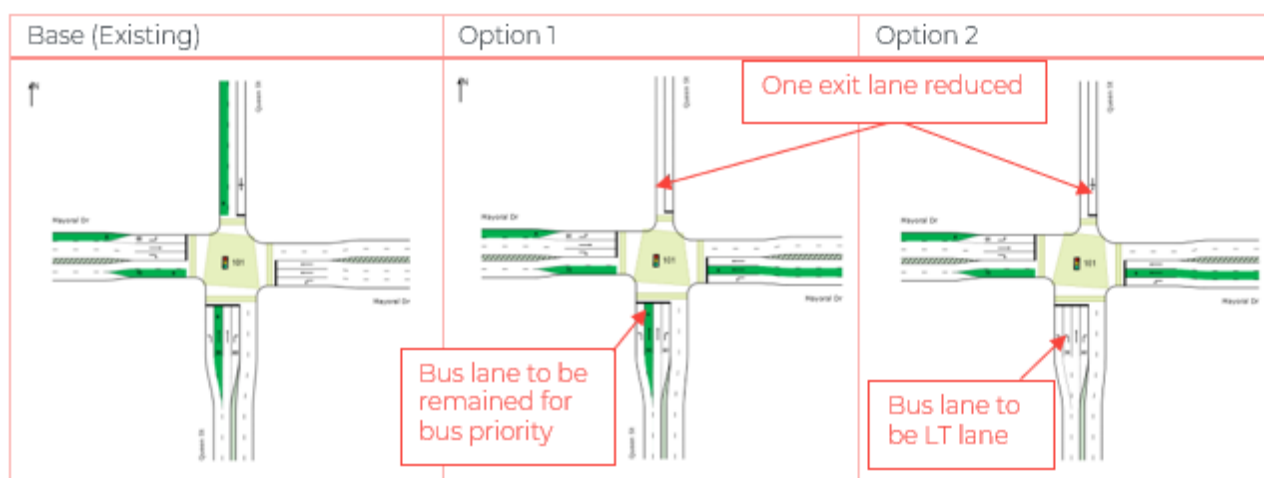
Mayoral Drive/Queen Street intersection - layout options
